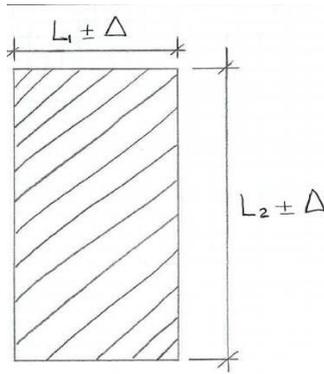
Cross-Section Beam, Colum and others Dimension of Elements
